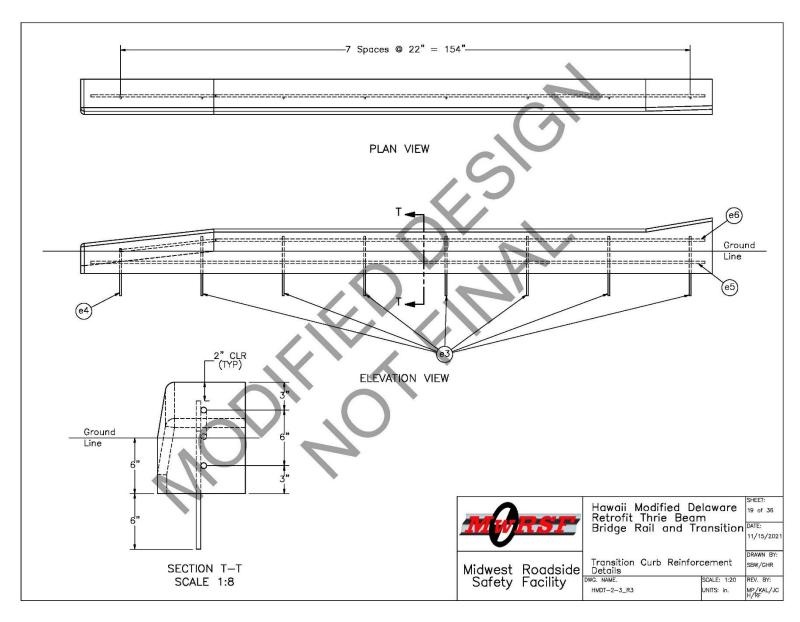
Transition Curb Reinforcement Details, Test Nos. HMDT-2 and HMDT-3
